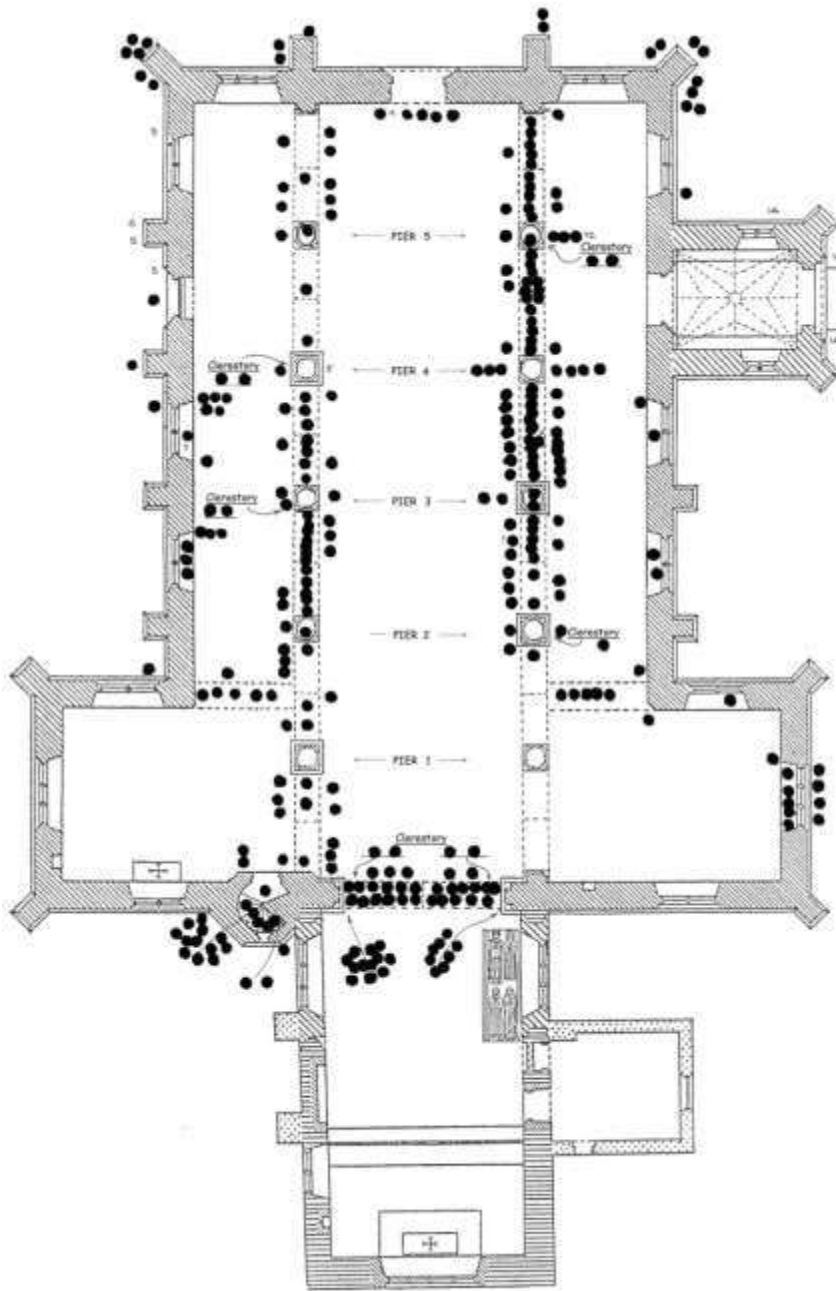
Pembridge church. Plan showing the locations of recorded masons' banker marks
